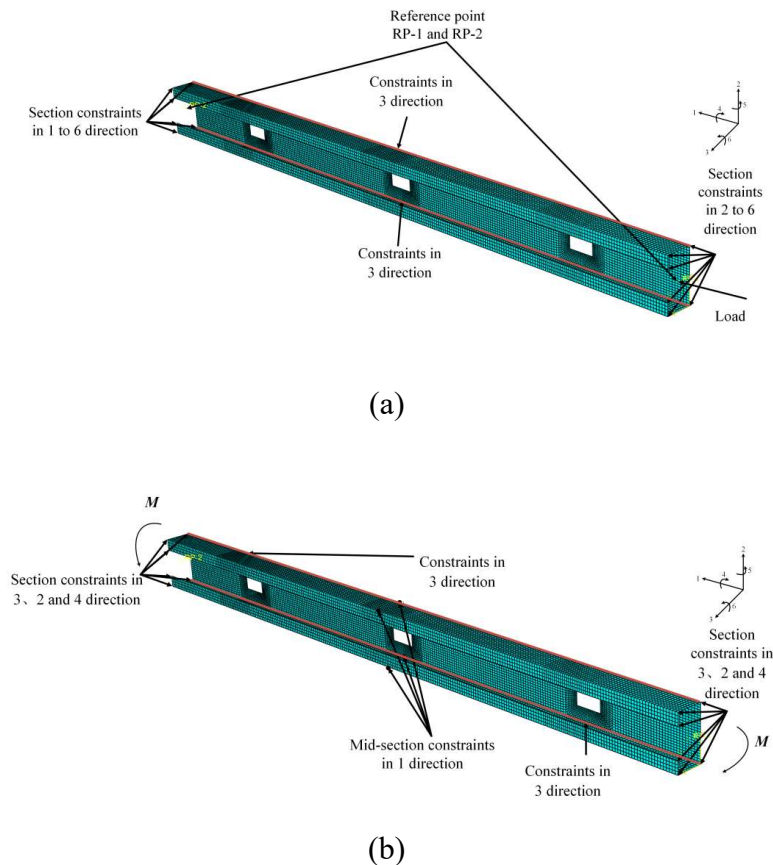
Finite element model of CFS lipped channel section with holes. (a) Axial compression members with holes. (b) Bending members with holes.
